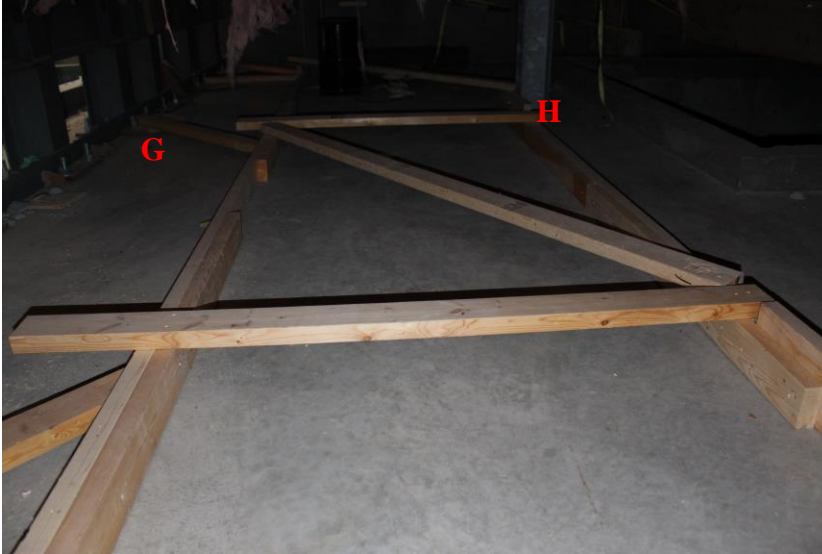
A steel column on the first floor extending upwards to provide a reaction for the cables from two load pads.
